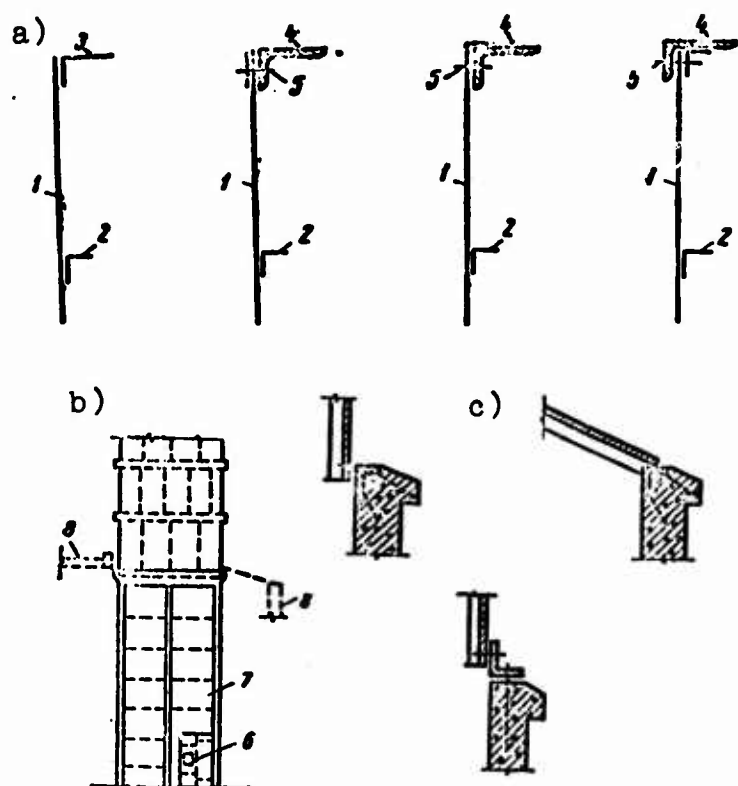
Planking and the hermetic sealing of a machine: a) the variations of planking of a machine using aluminium sheets; b) diagram of a pile driver machine with hermetic planking and windlasses; c) the union of the planking of the pile driver and of designs of a deckhouse building; 1 - aluminium sheet; 2 - auxiliary aluminium corners or bands, joined to sheet 1 by contact welding; 3 - braced aluminium corner, joined to sheet 1 by contact welding; 4 - braced steel corner stained in two layers of aluminium paint along the entire perimeter of the section and joined with the aluminium design by bolts; 5 - bolt; 6 - control opening; 7 - hermetic windlasses; 8 - designs of deckhouse building adjacent to the machine.
